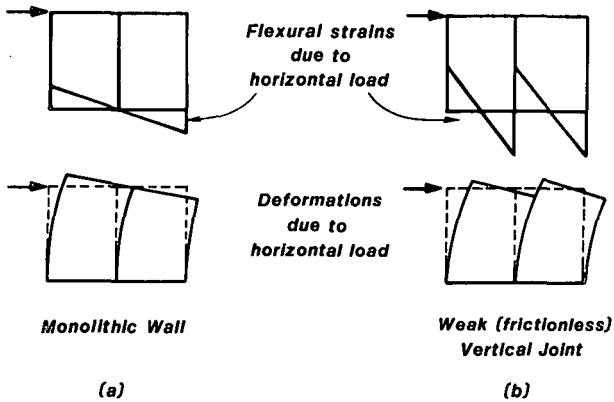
Panelized Wall With Monolithic and Frictionless Vertical Joint When Horizontally Loaded
